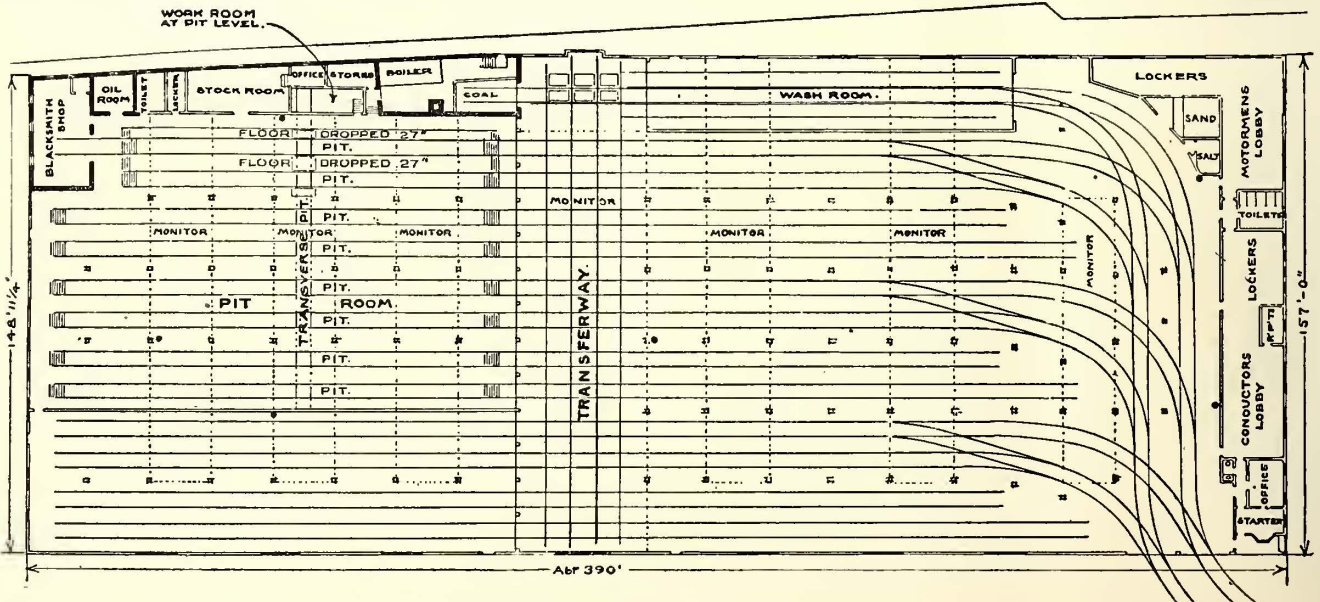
Plan of Car House Built Parallel to and on Street Line
